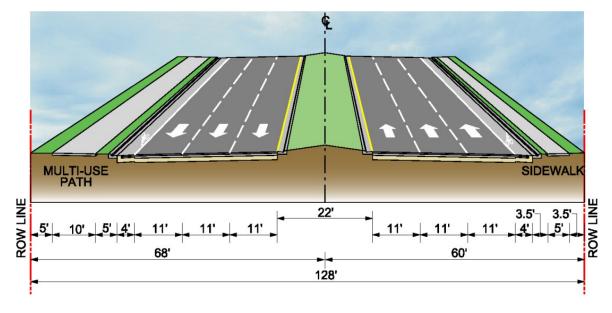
SIX-LANE DIVIDED URBAN TYPICAL SECTION PROMENADE TOWN CENTER TO FORT KING ROAD
